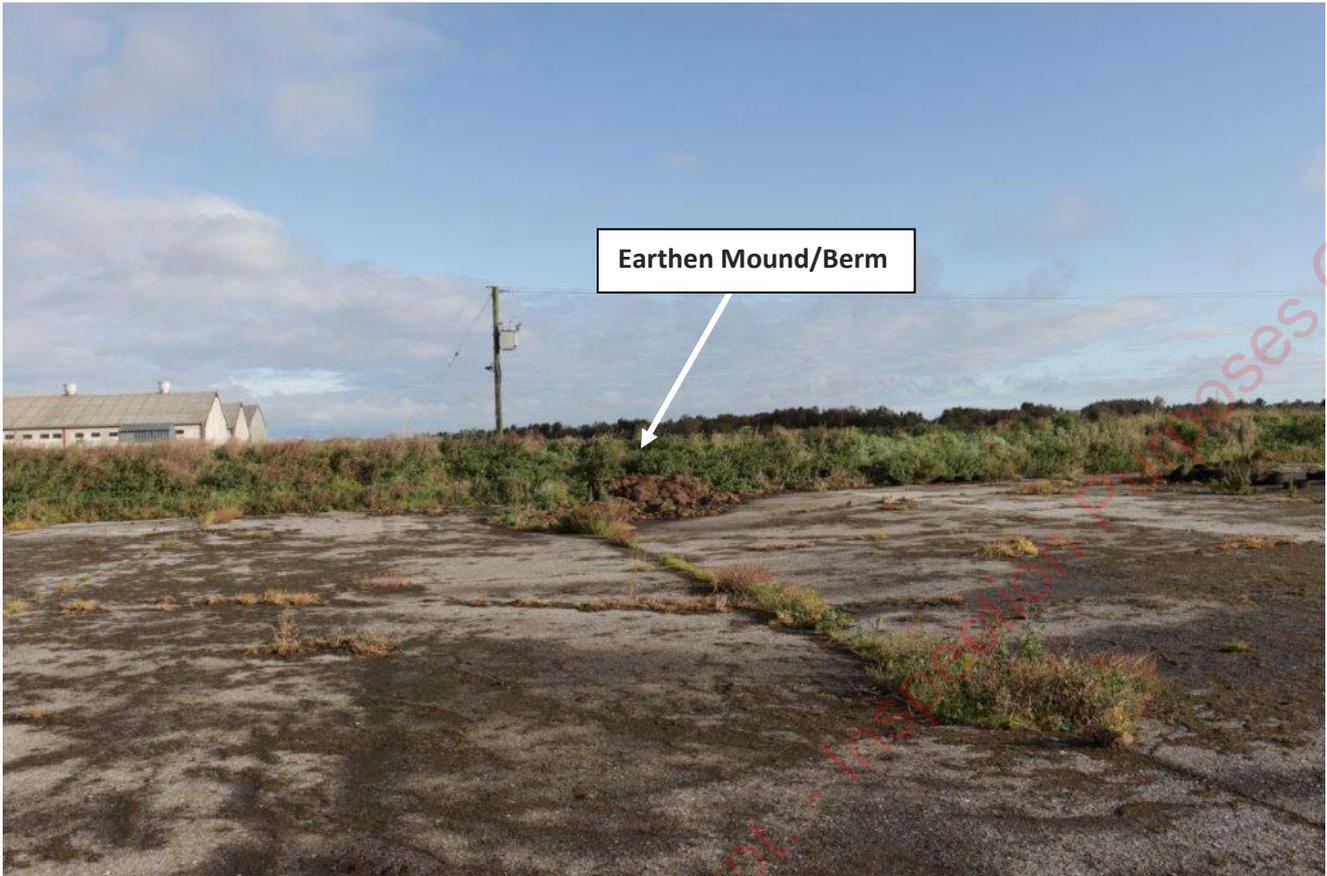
Concrete Yard and Earthen Mound/Berm
